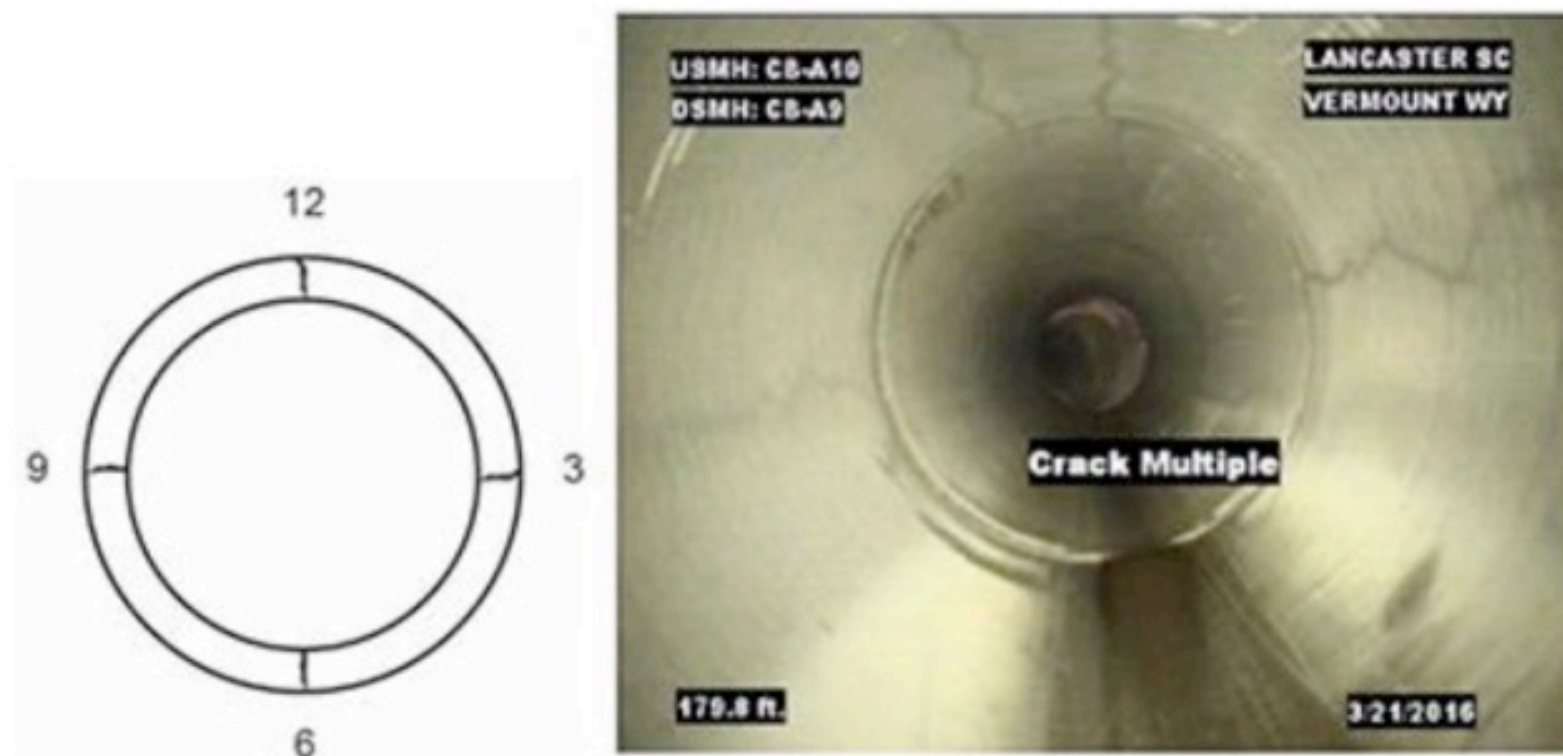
Hinged Cracks (Multiple Longitudinal Cracks)
